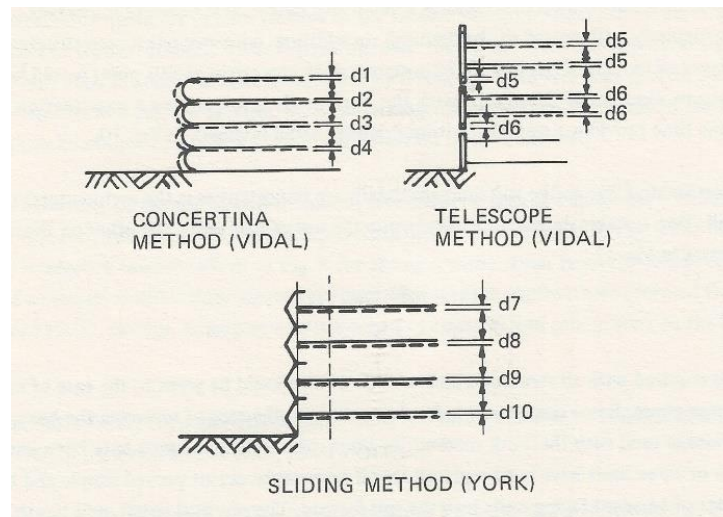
Construction methods for reinforced soil (GEO, 2002).
